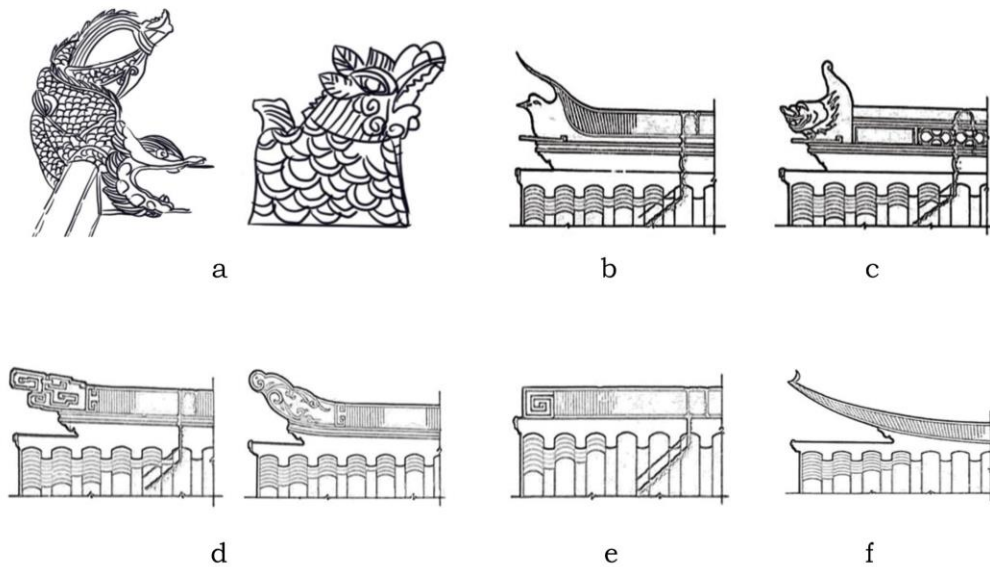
Roof ridge (a. Dragon mouth ridge b. Chicken ridge c. Dragon ridge d. Striped head ridge e. Sugarcane ridge f. Female hair ridge).
